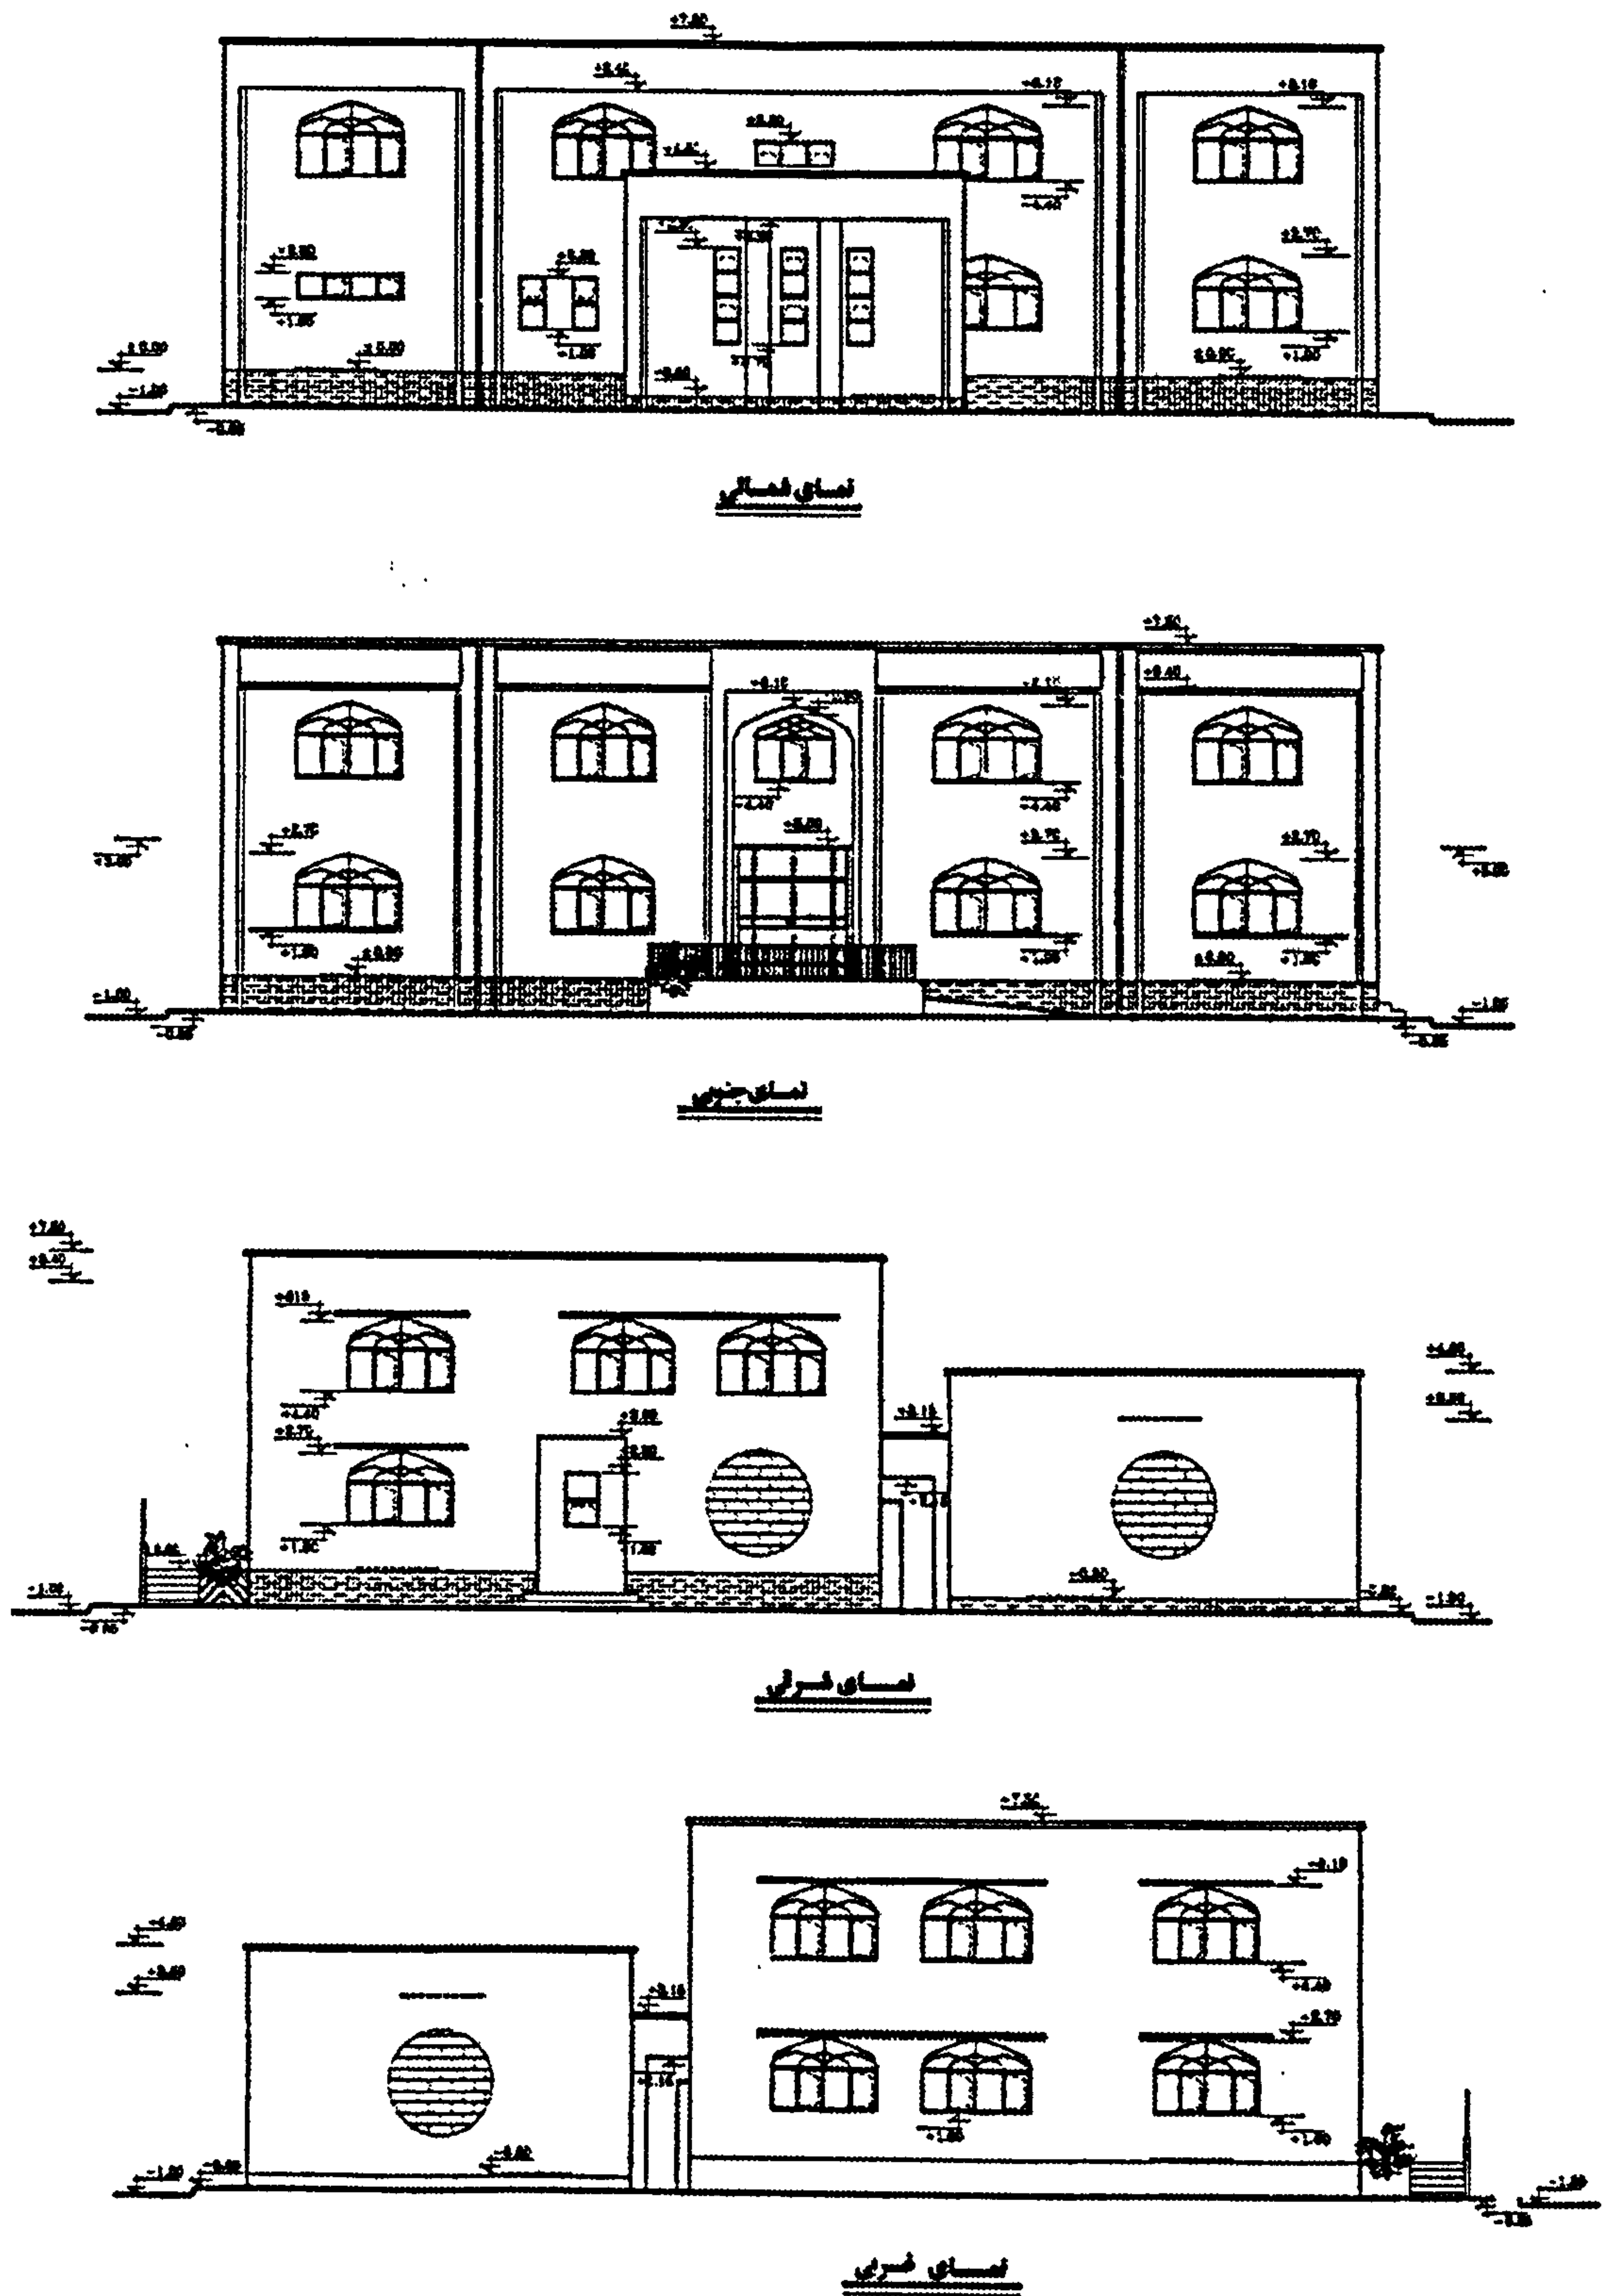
The north, south, east and west elevations of a special primary school with 9 classrooms (Number 6)
